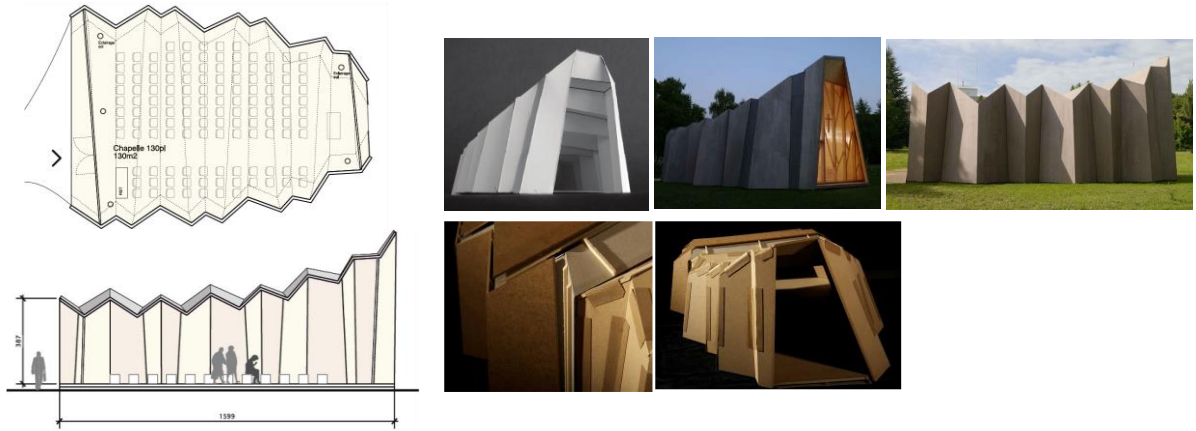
Illustrates horizontal and sectional projections, perspectives, and methods of fabrication and installation of the temporary saint's church, whose 7-meter-high wooden walls can be folded to support a roof up to 12 meters above the nave. [12]
